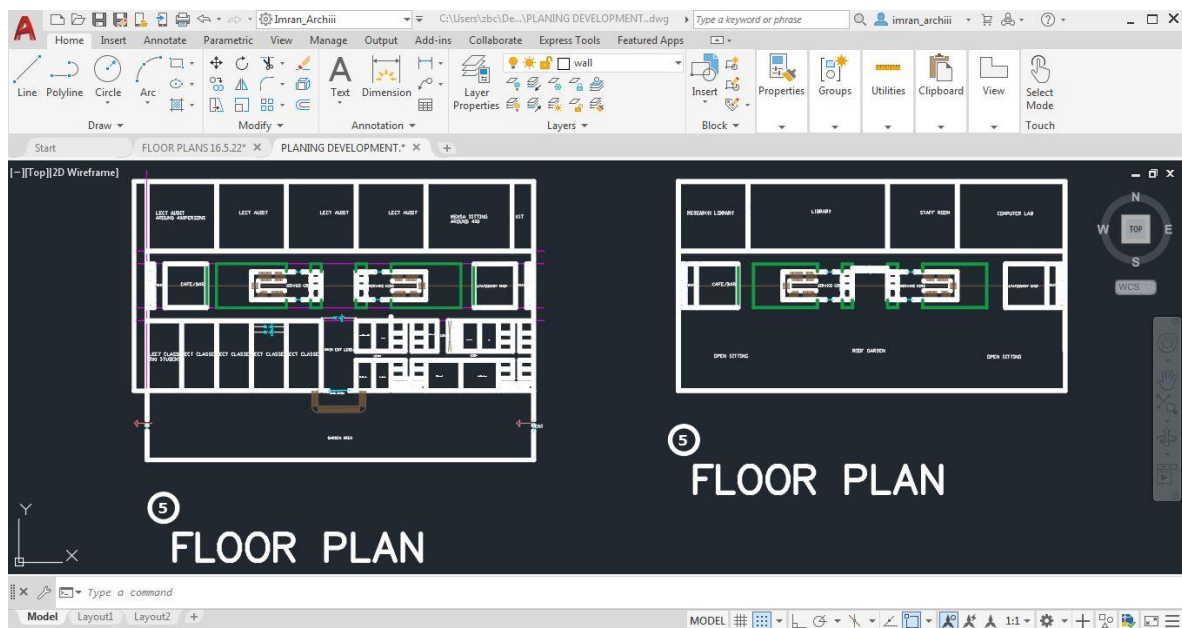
Layout stage-2, in Autodesk AutoCAD 2020 [55]
